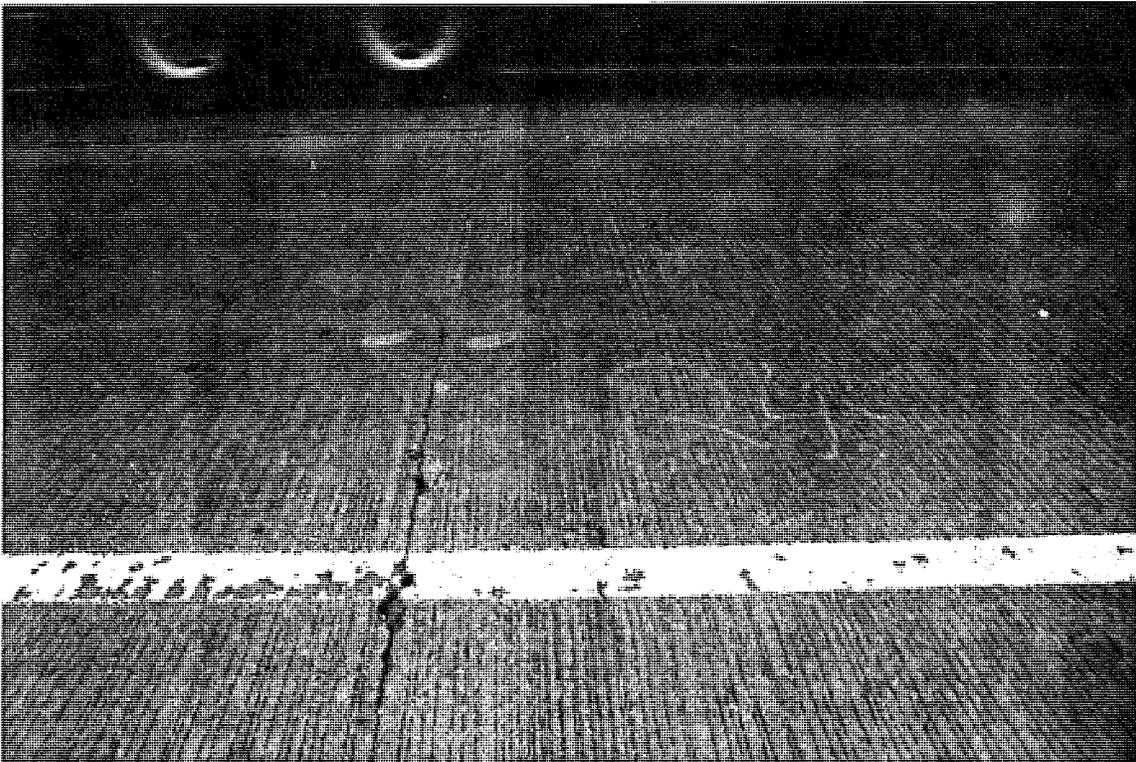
A close-up of a full width transverse crack in CSN# 11017-32516A (Section C), EB. The beginnings of spalling can be seen at the bottom of the photo.
